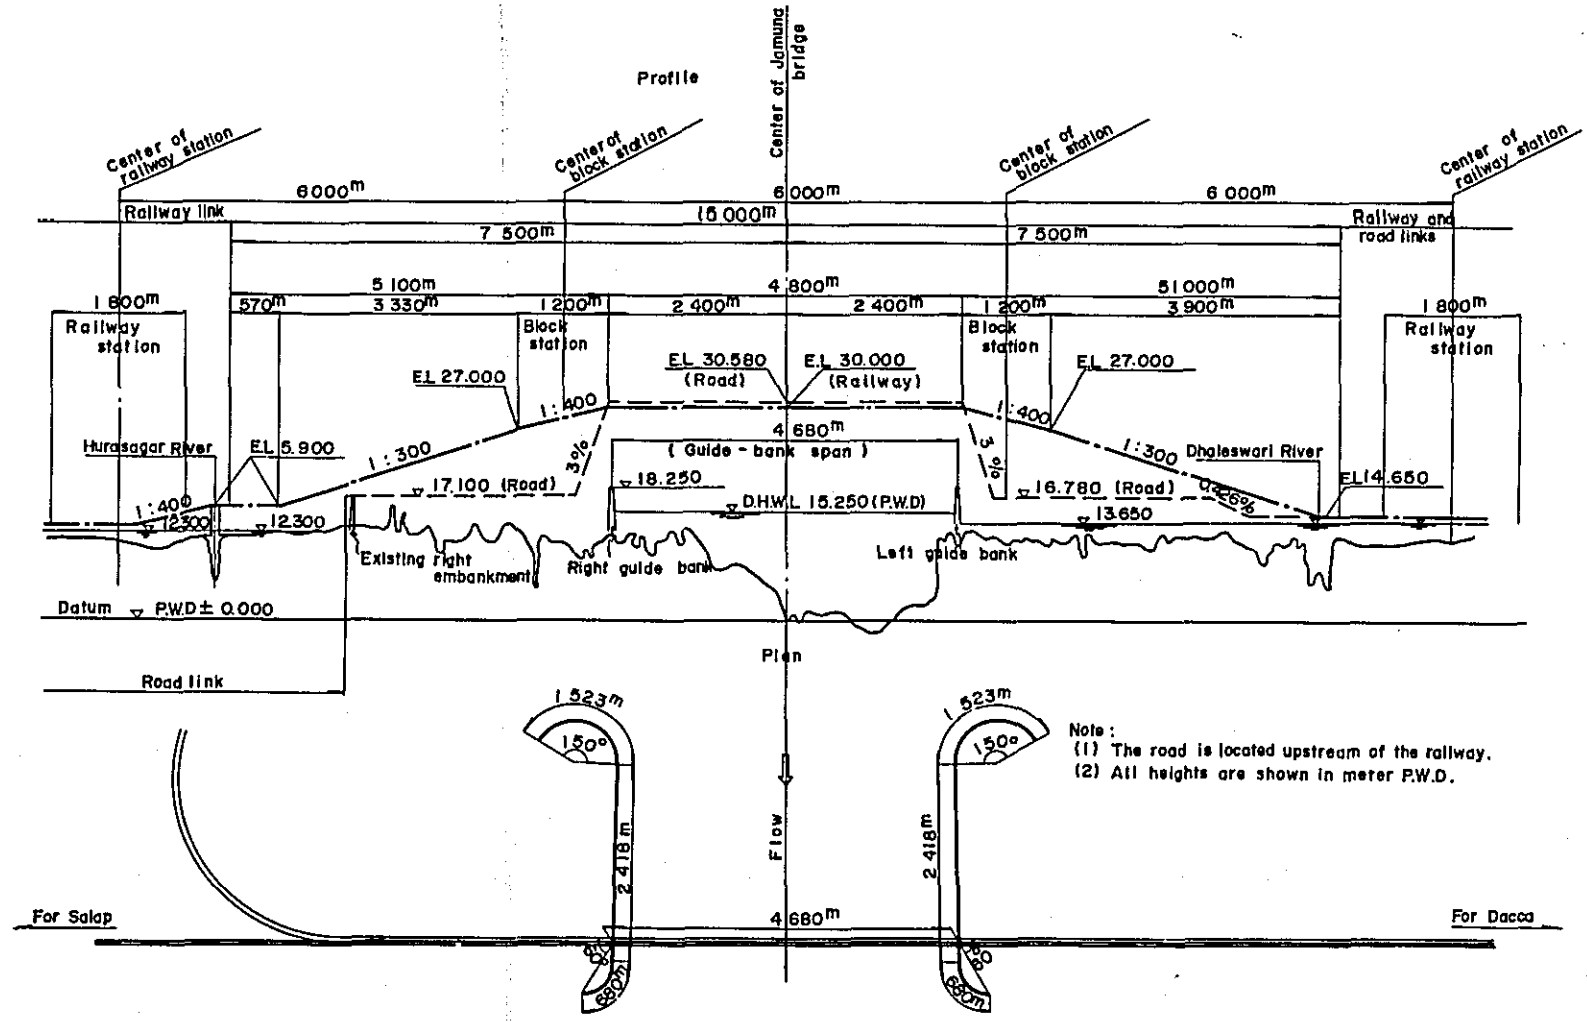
Jamuna Bridge, Railway Links and Road Links
